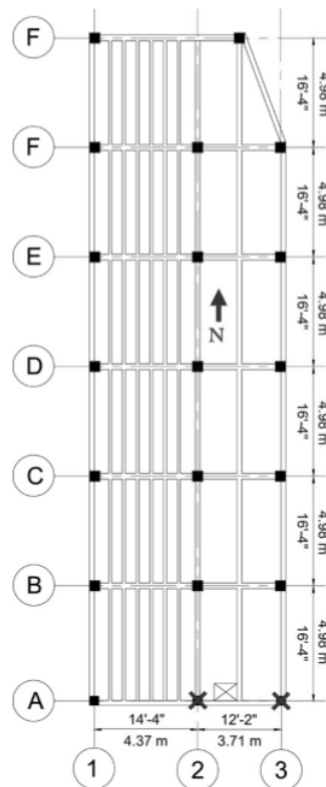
Plan of San Diego Hotel and blew up columns (crosses) [60]
